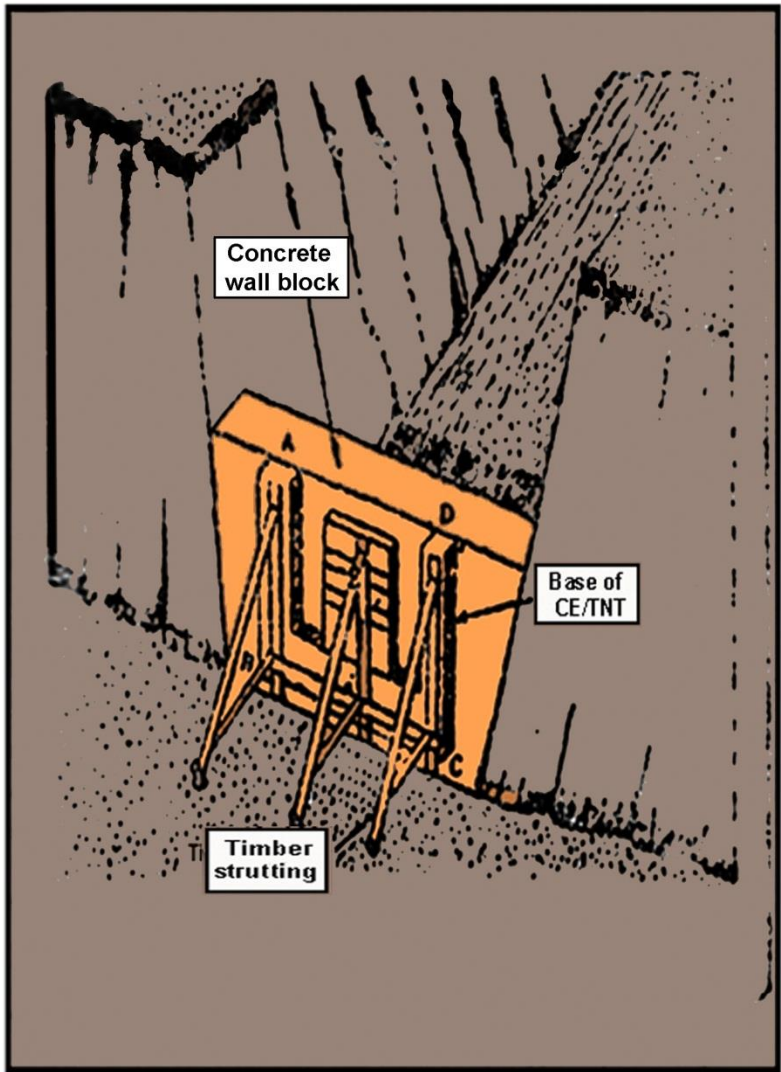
Breaching a lightly reinforced concrete wall block Hasty method.
